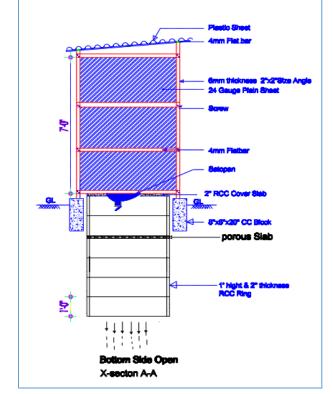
Plan and sectional view of Type-1 Biofil toilet
